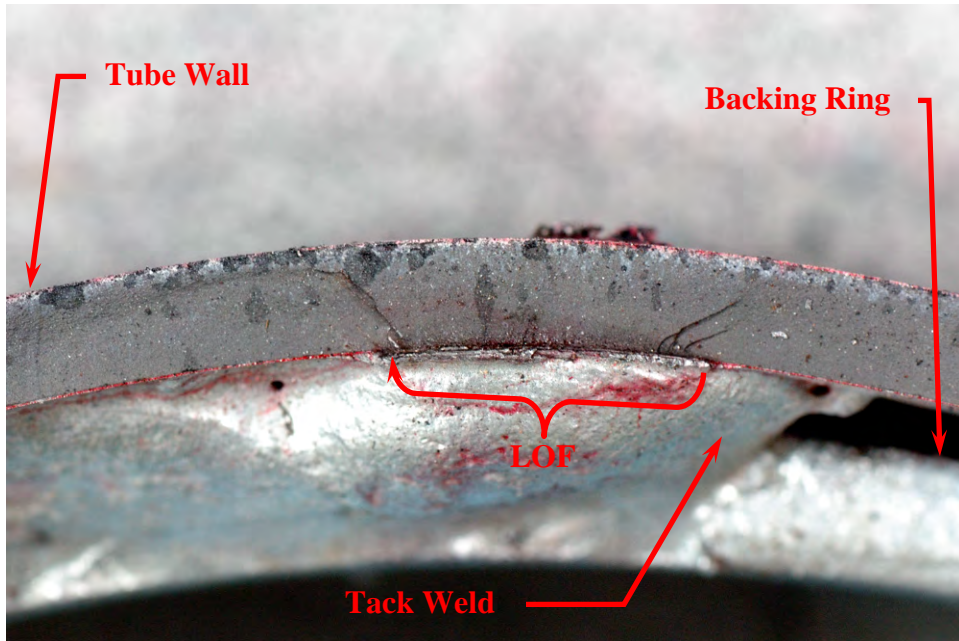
Exposed fatigue fracture surface in the arm of specimen III-6 showing crack origin at the lack of fusion (LOF) between the tack weld and the tube wall (refer Figure 45 for view direction)
